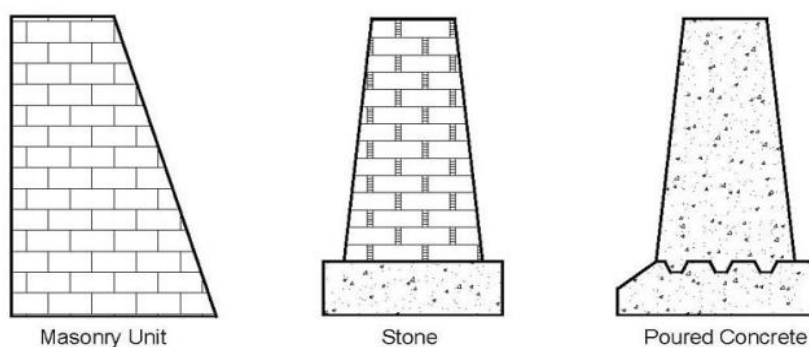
Types of gravity walls. (<http://www.wikiwand.com/>)
